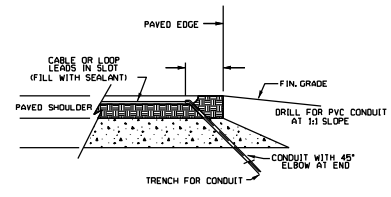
DETAIL PLAN OF LOOP SLOTS NOT TO SCALE
